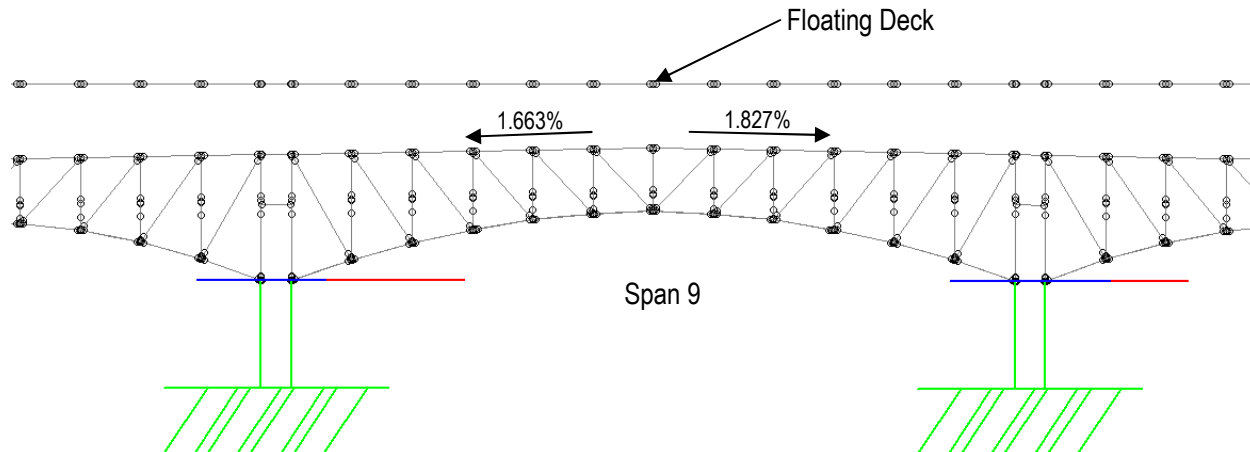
Floating deck shown above truss over Span 9 in STAAD model.
